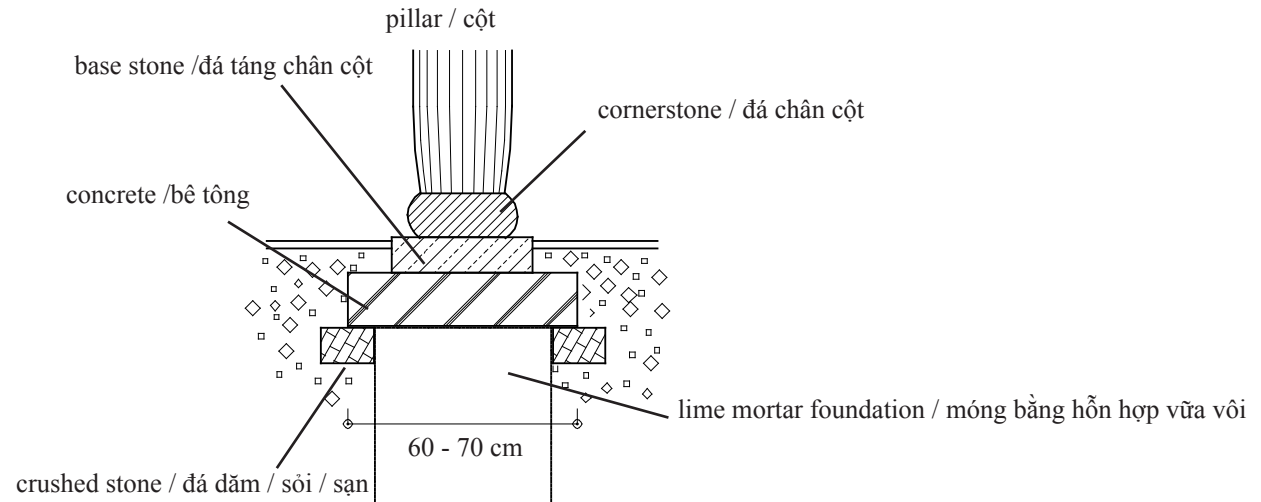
Repair work to fix uneven subsidence of foundation / Sửa chữa lún móng
